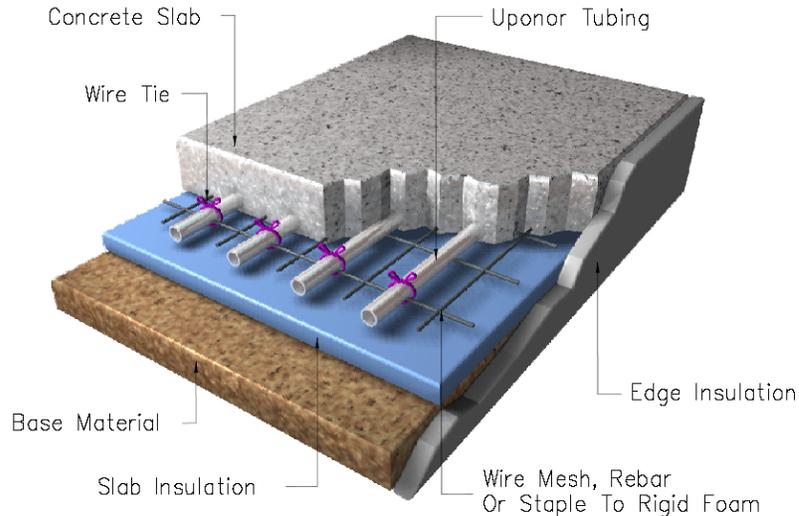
Concrete floor radiant heating system with edge and slab insulation (Uponor 2008).
